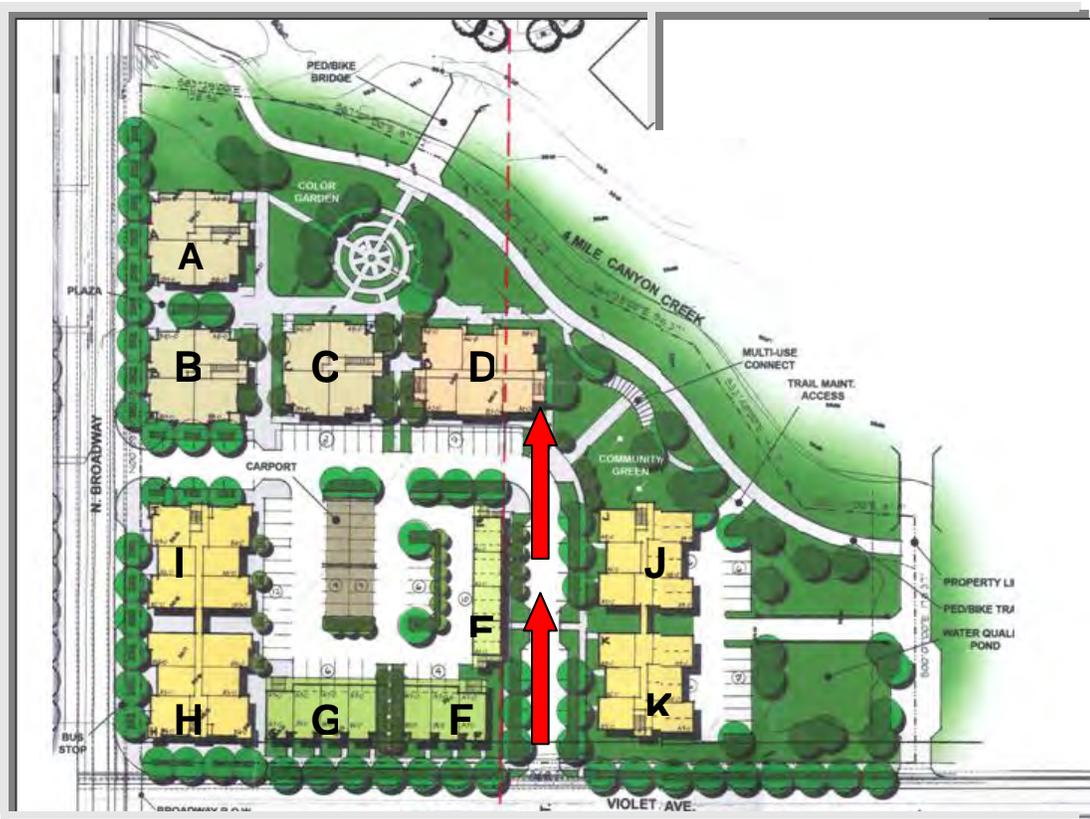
Concept Plan Layout (from Dec. 2009) blocked visual connection to bridge
